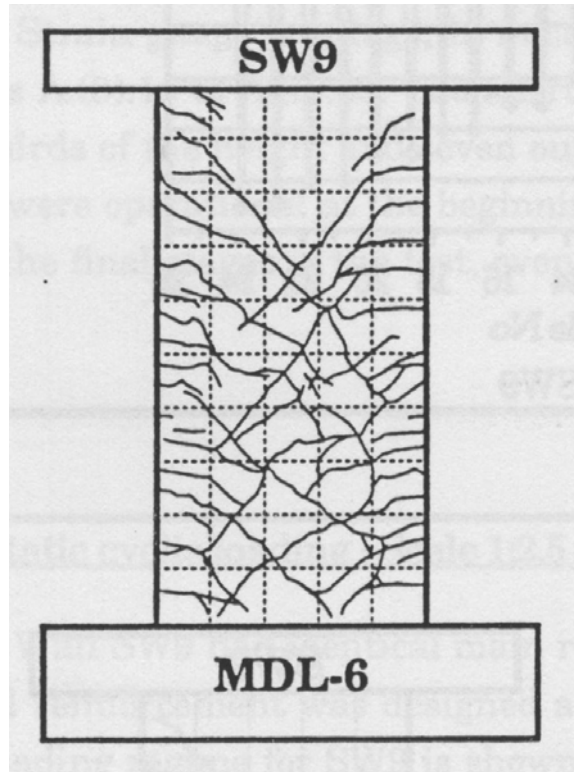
Condition of wall SW9 at 0.50% drift [Pilakoutas (1991)]
